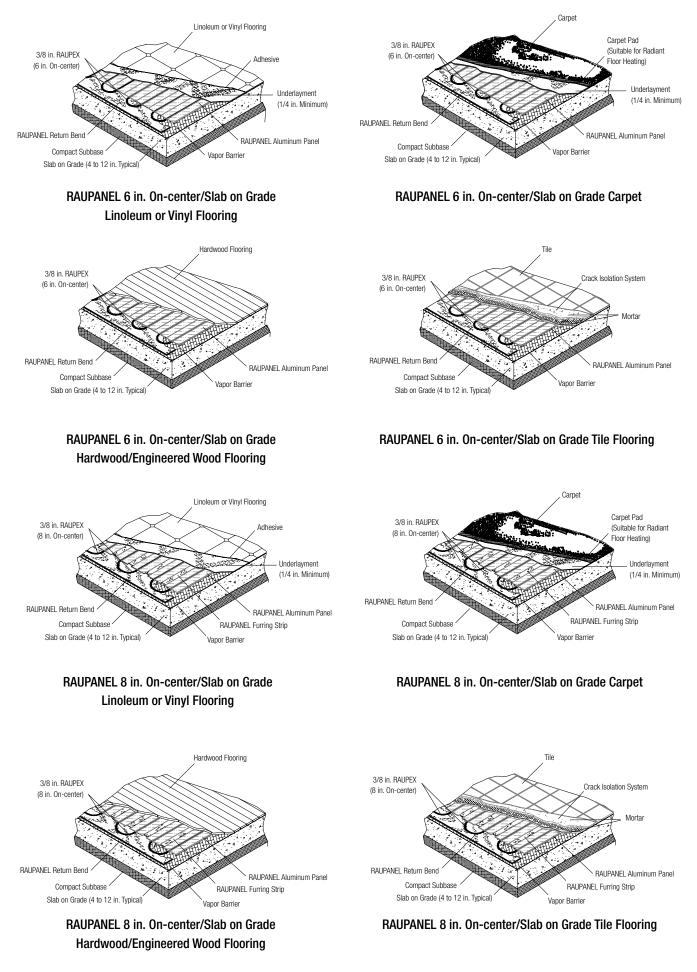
Typical finished floor assemblies over RAUPANEL applied to slab.
